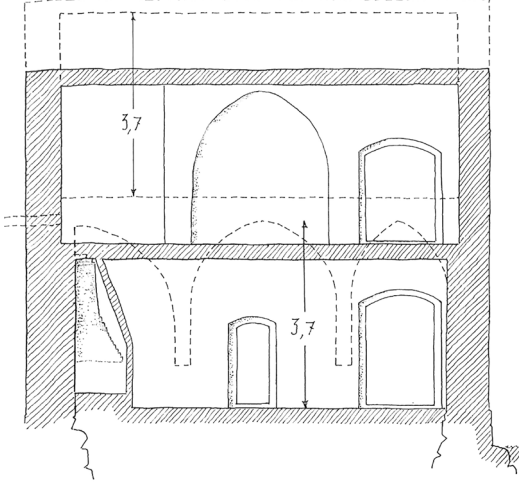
The Thott House, reconstructed profile. (Anderson 1964, 13).
